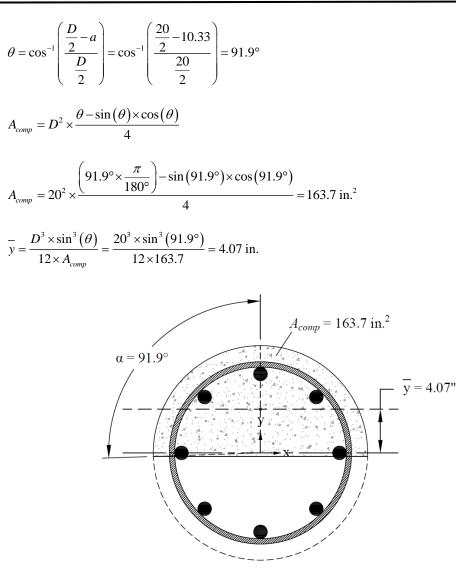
Cracked Column Section Properties ($f_s = 0.5 f_y$)
